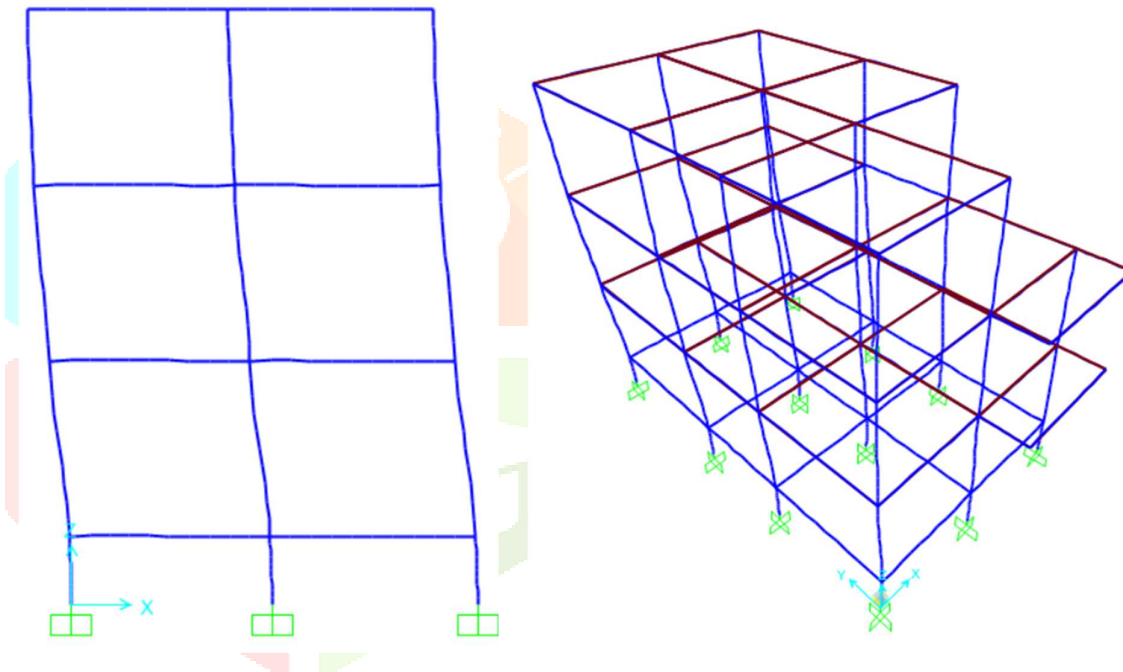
Deformed shape of the building on elevation and 3D view
